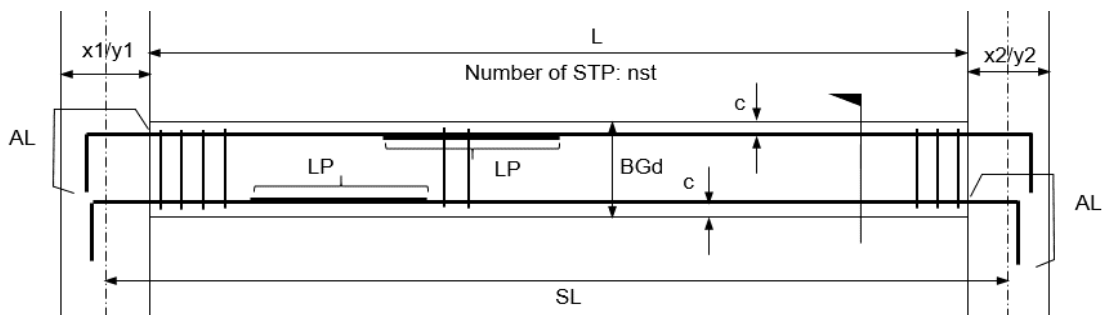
Arrangement of Girder Main bar (Sample of rebar arrangement)
